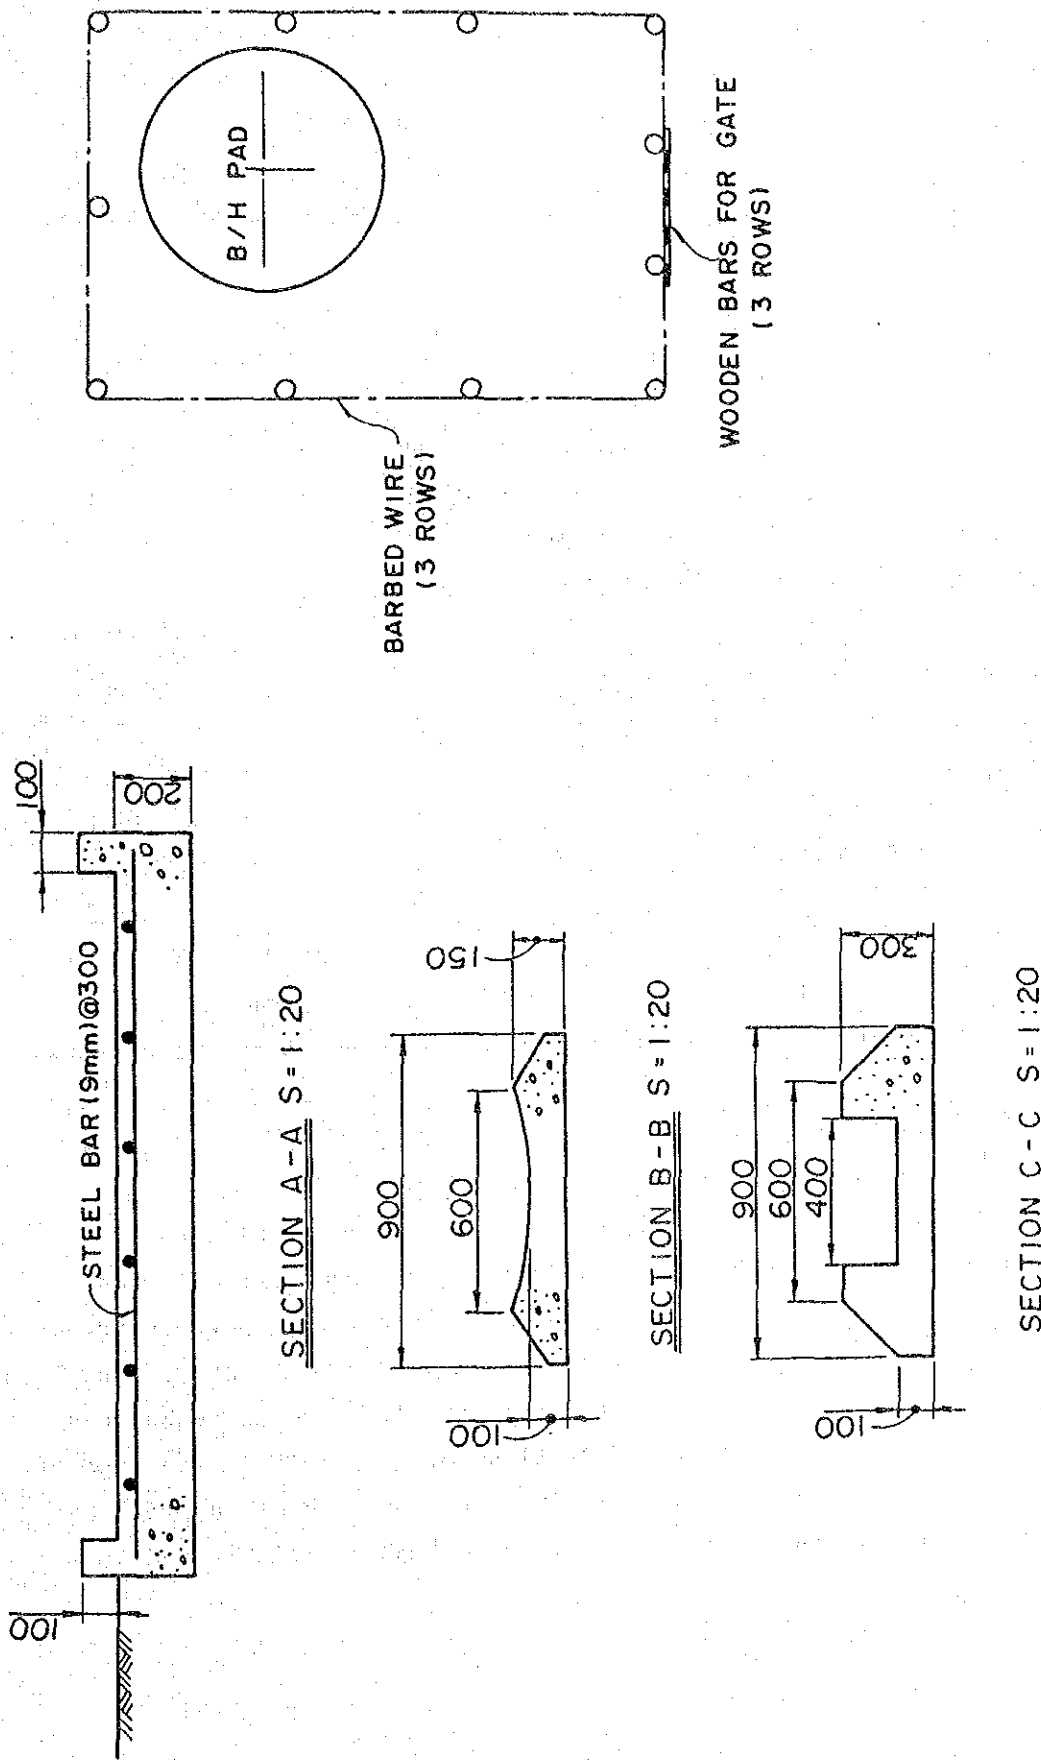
(2) DETAIL OF SECTIONS AND PLAN OF FENCE
